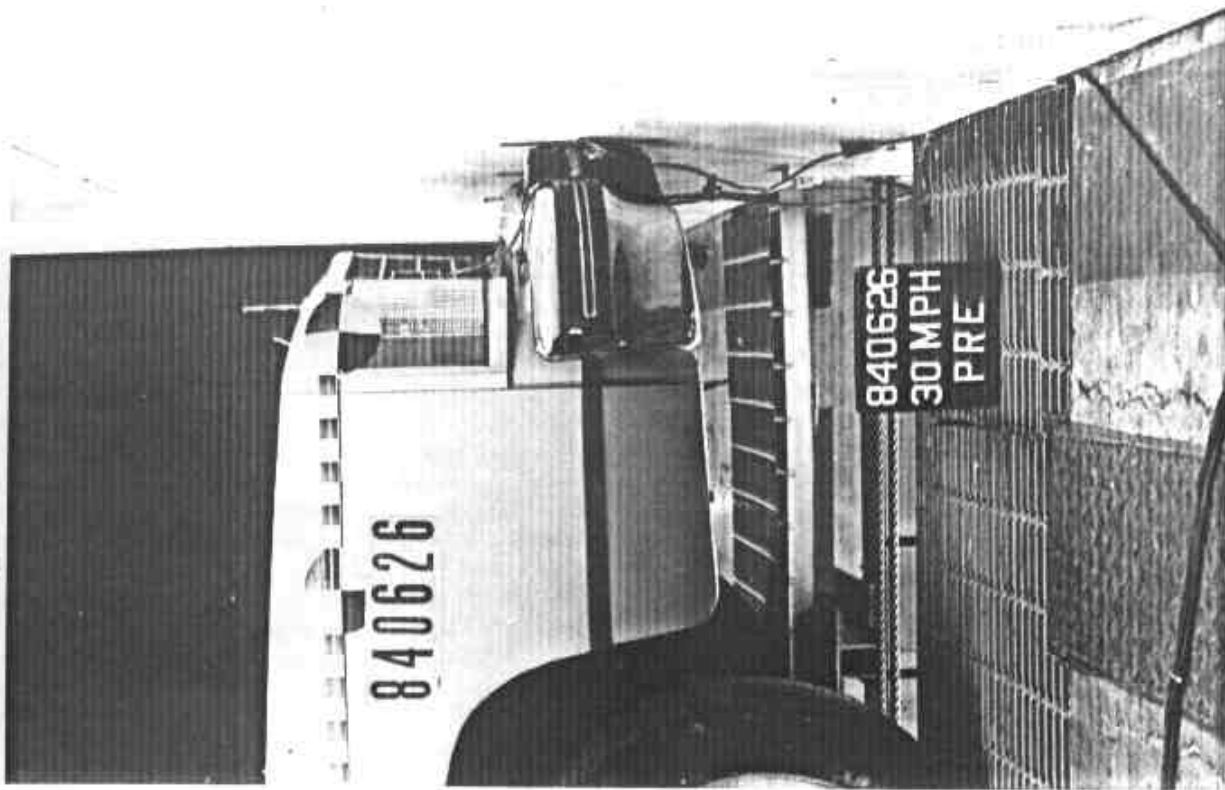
PRE-TEST PASSENGER SIDE CLOSE-UP
